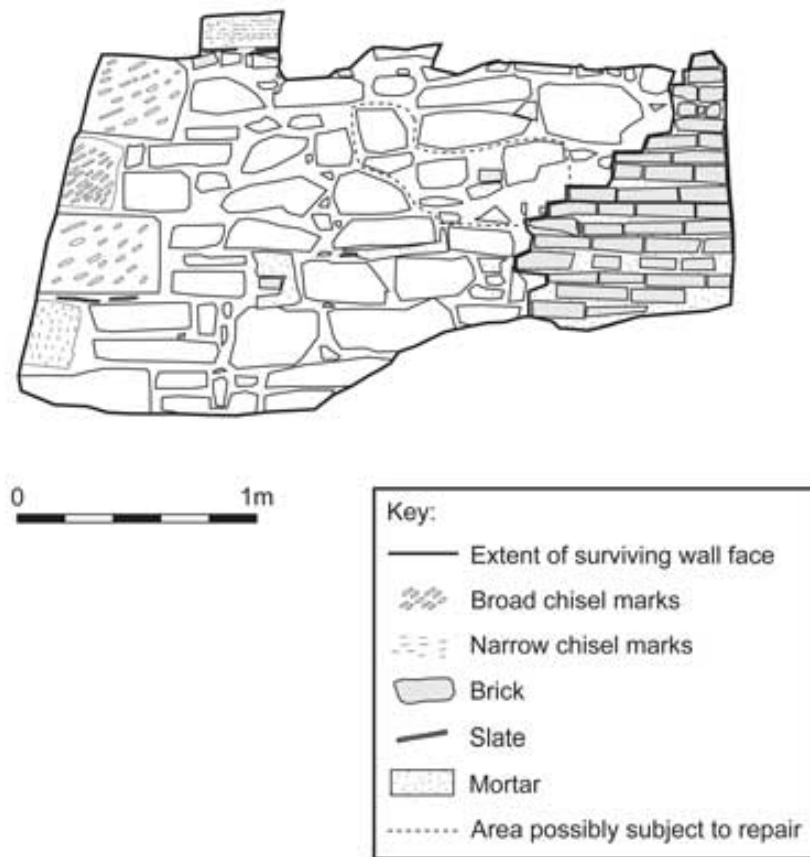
Structure 2, East Stair: Elevation b (South-facing Revetment)
